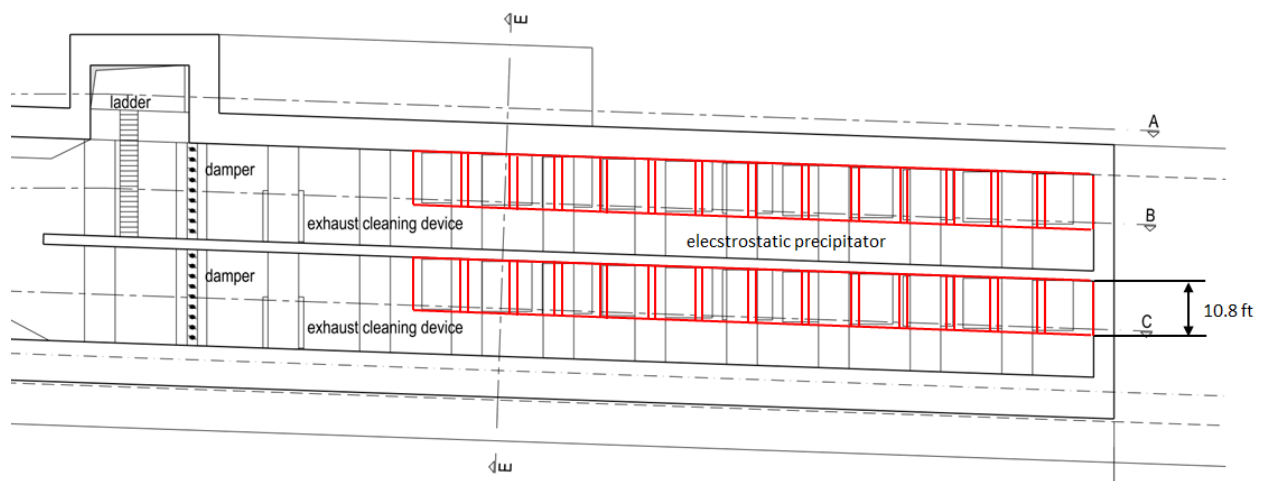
Spacing of EP Air Cleaning Equipment, Portal Building South, Longitudinal Section
